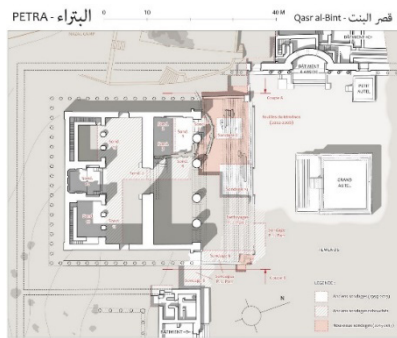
Qasr Al-Bint reconstructed plan with outdoor temenos.
